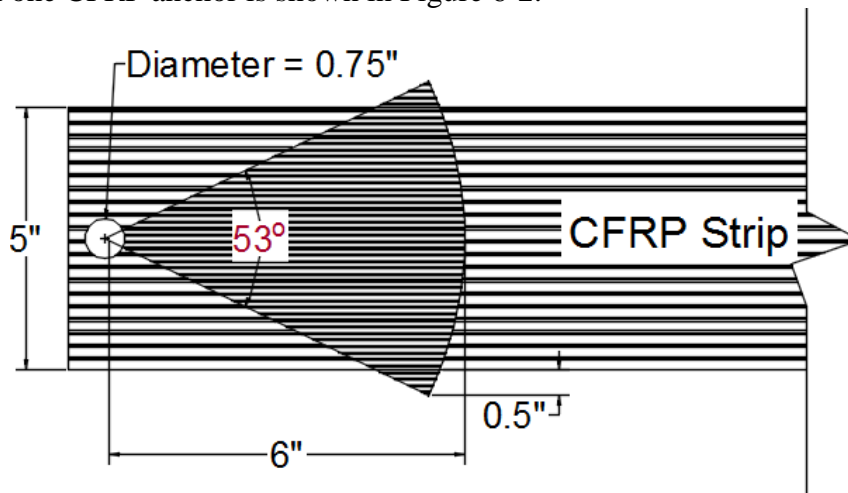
Layout of CFRP strip with one CFRP anchor
